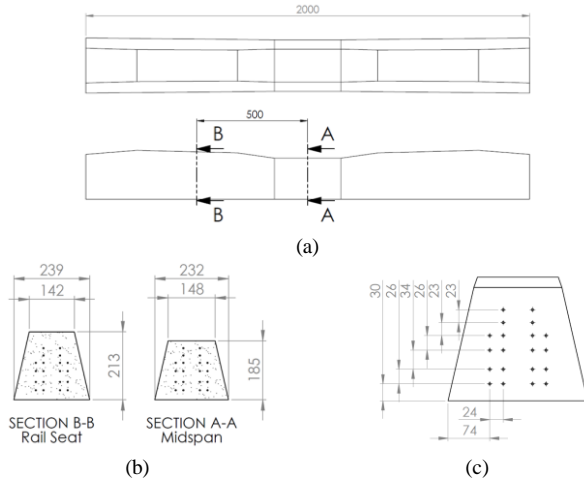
SRT prestressed concrete sleeper [11] (a) overall, (b) cross-section, and (c) reinforcement wire position
